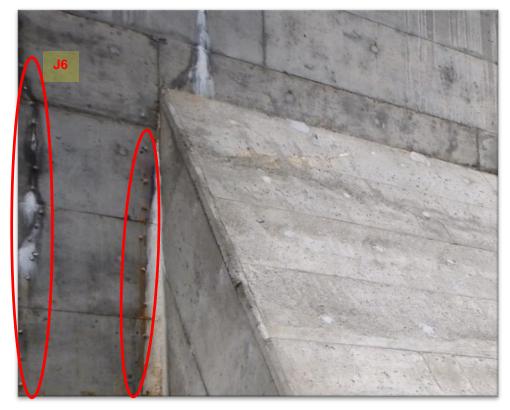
Efflorescence and staining at J6, left abutment. Injection ports from seepage repair shown.
